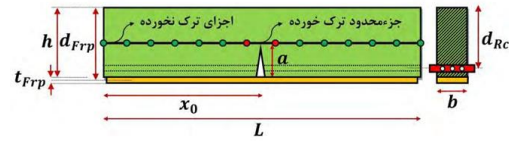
Cracked and uncracked finite elements in reinforced concrete beam reinforced with FRP sheets
